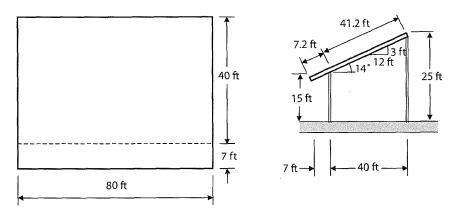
Dimensions of the Retail Store Strip-Mall
